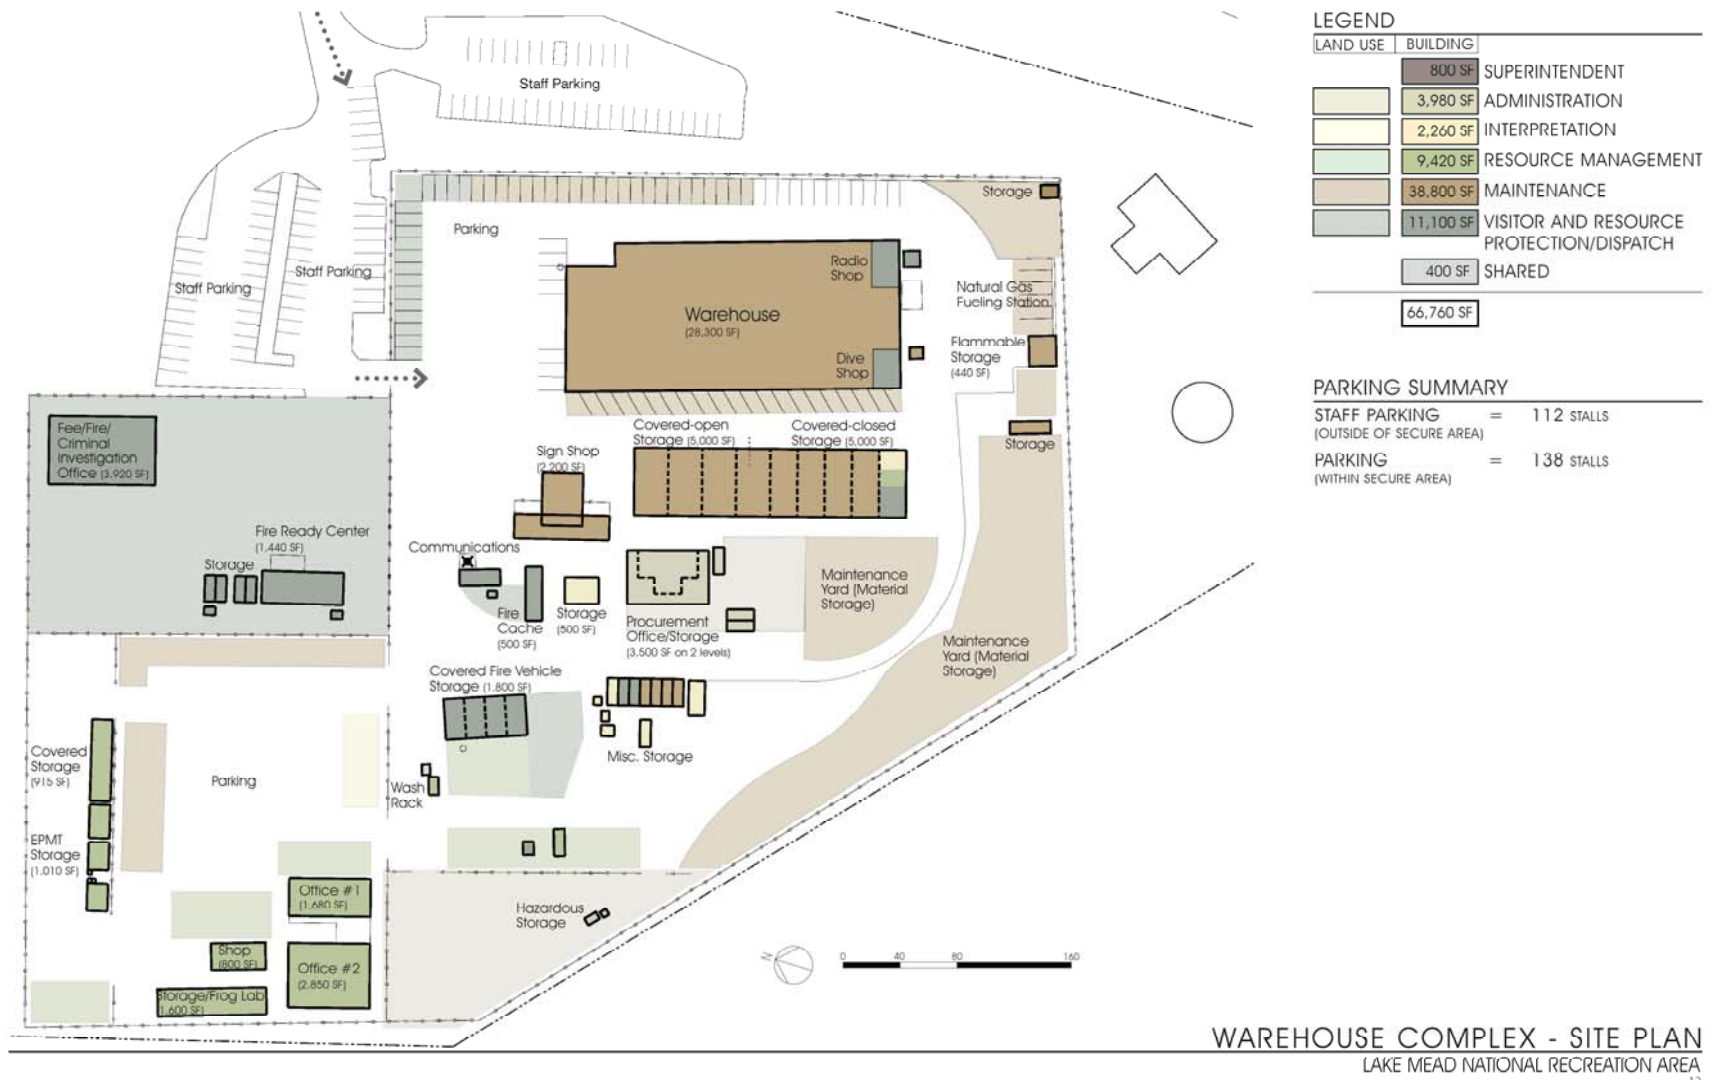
Existing layout of the Warehouse Site (courtesy of *ajc architects*, 2007).
